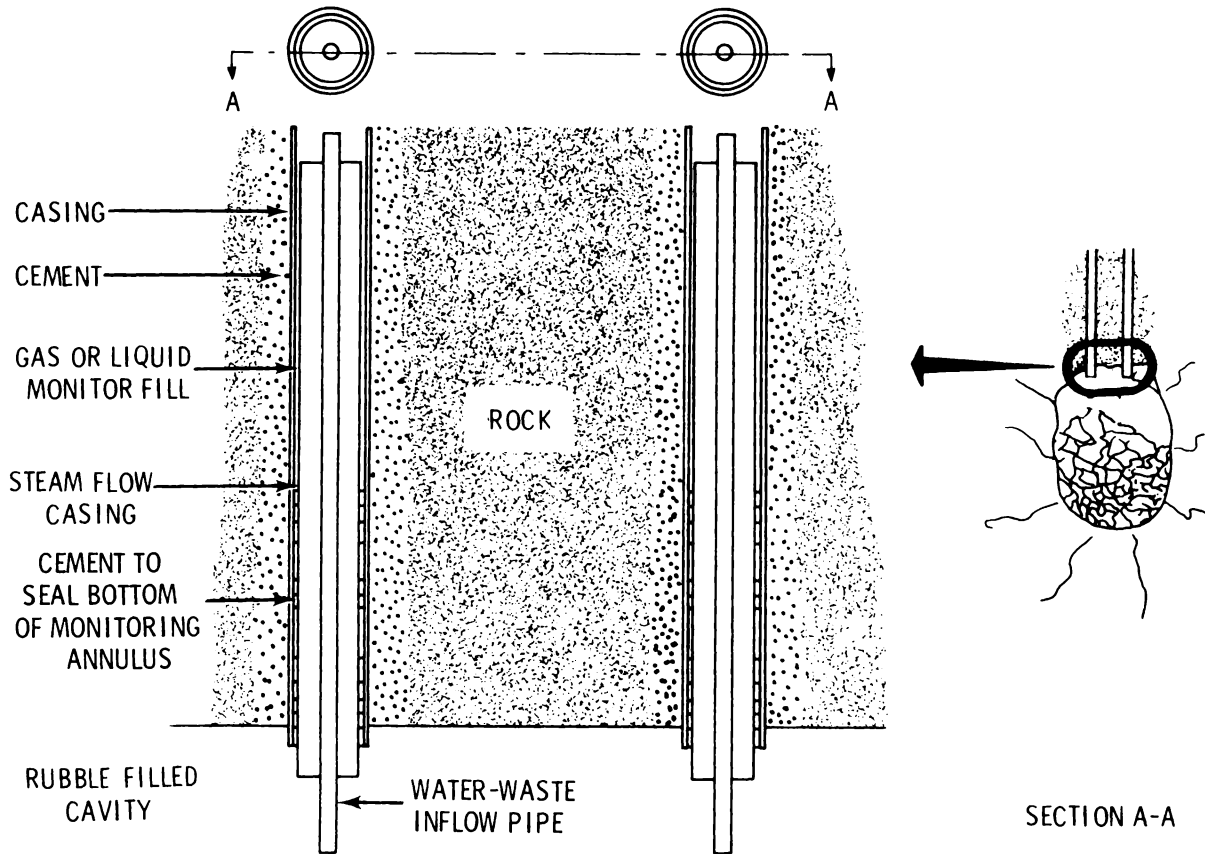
Pipe and Bottom Hole Configuration for Exploded Cavity Concept with Liquid Waste
